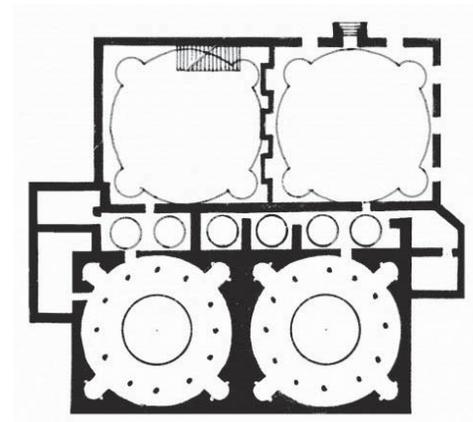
Floor Plan of *Cemberlitas Hammam*, Istanbul, Turkey.
